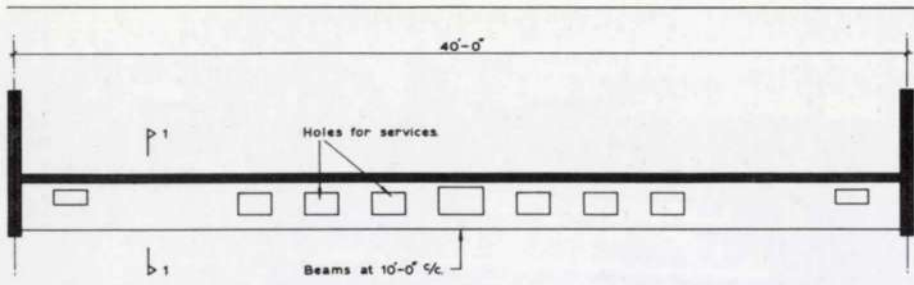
Typical floor beam, Birmingham University Biology Building.
